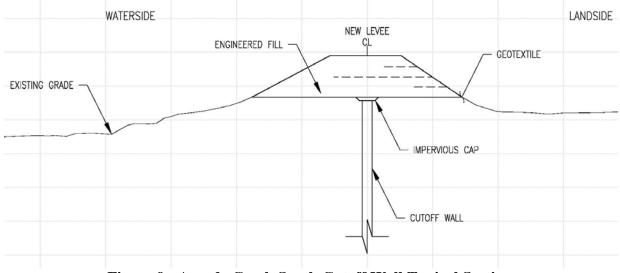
Arcade Creek South Cutoff Wall Typical Section
